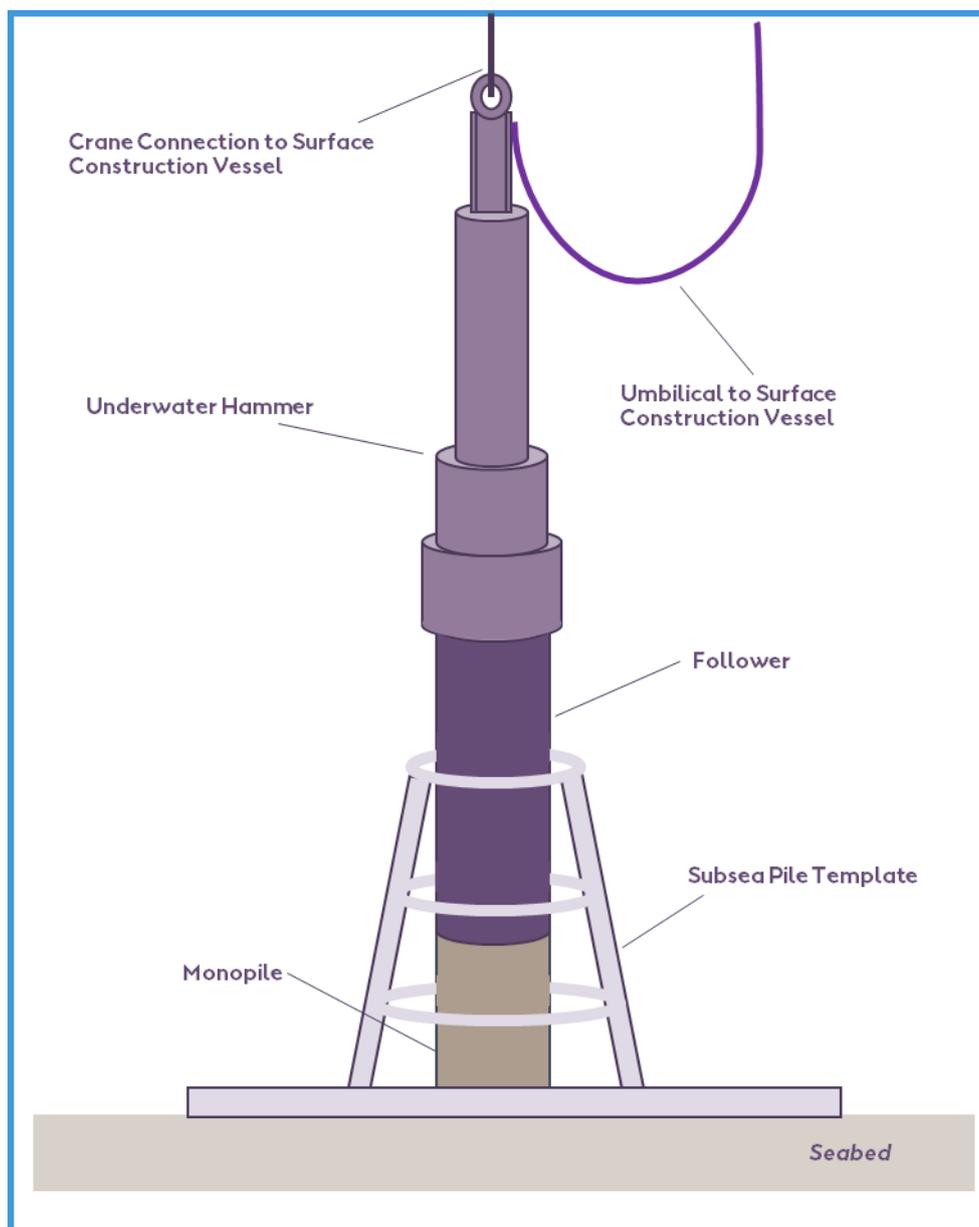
Example set-up of equipment used to drive sub-sea piles for mooring anchors
